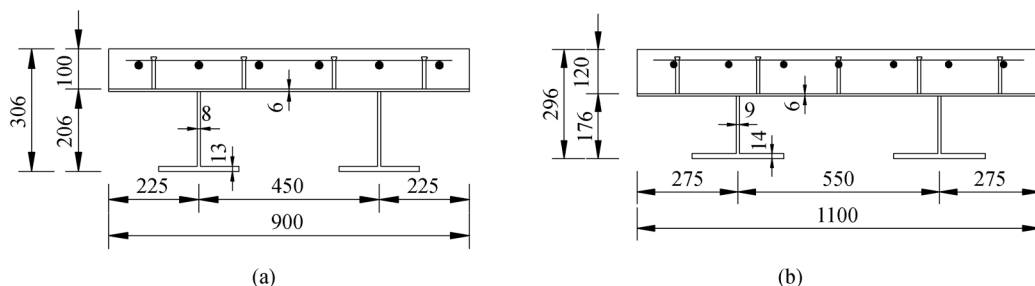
Dimension of the specimens (unit: mm). (a) Cross section of S-1; (b) cross section of S-2
